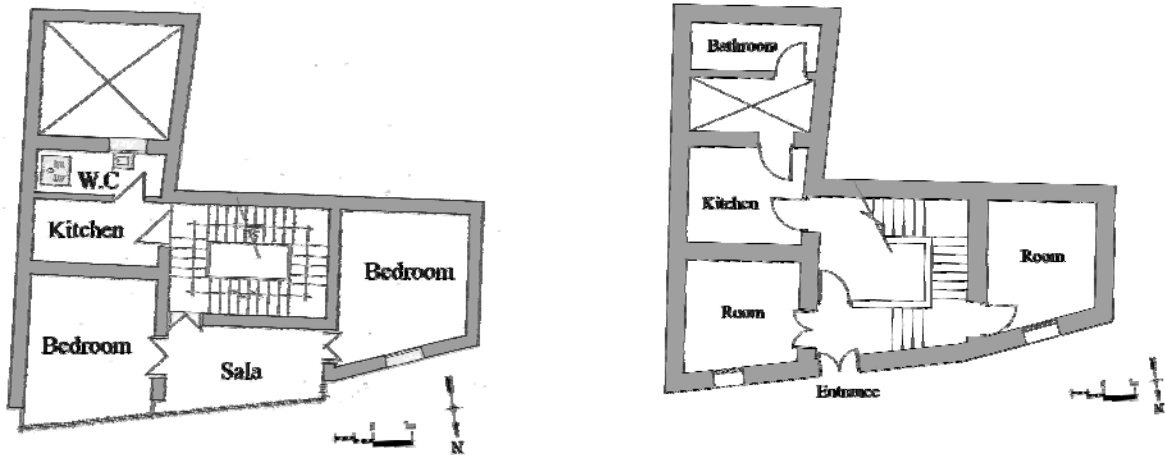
(Right) Ground Floor Plan مسقط الدور الأرضى
